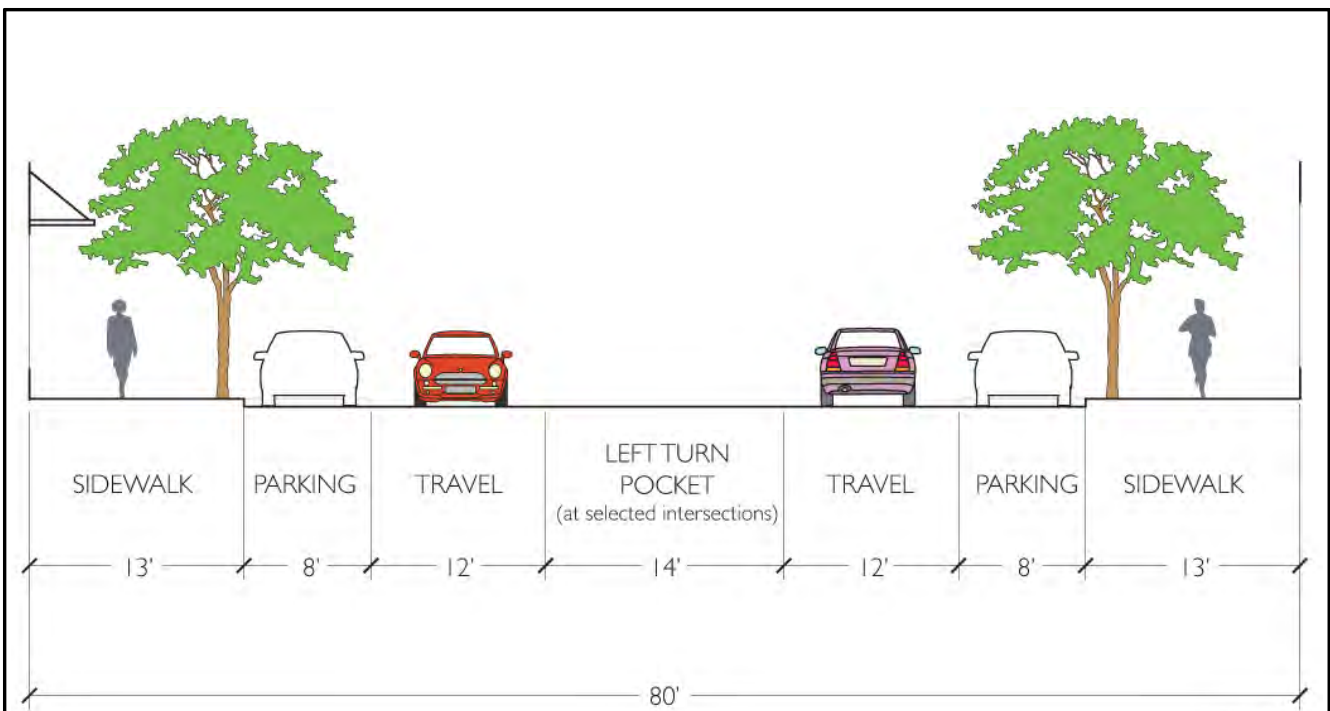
Typical West Broadway Avenue Section (for illustrative purposes only)
